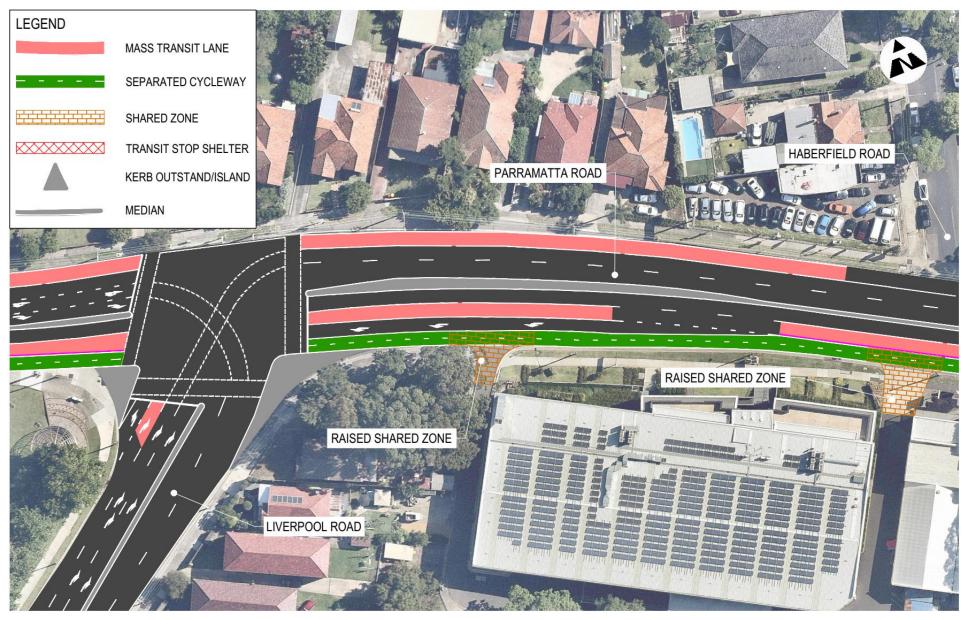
Parramatta Road space reallocation concept – Taverners Hill
